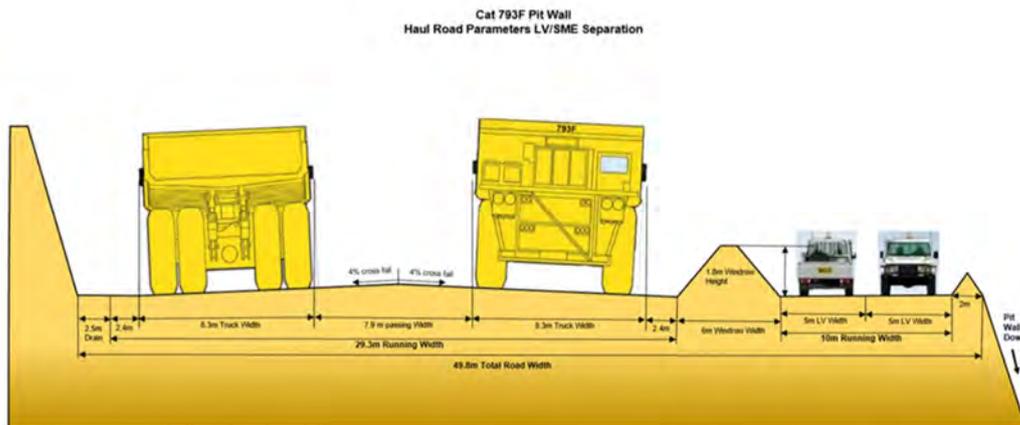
CAT 793F Pit Wall (Haul Road Parameters LV/SME Separation)
